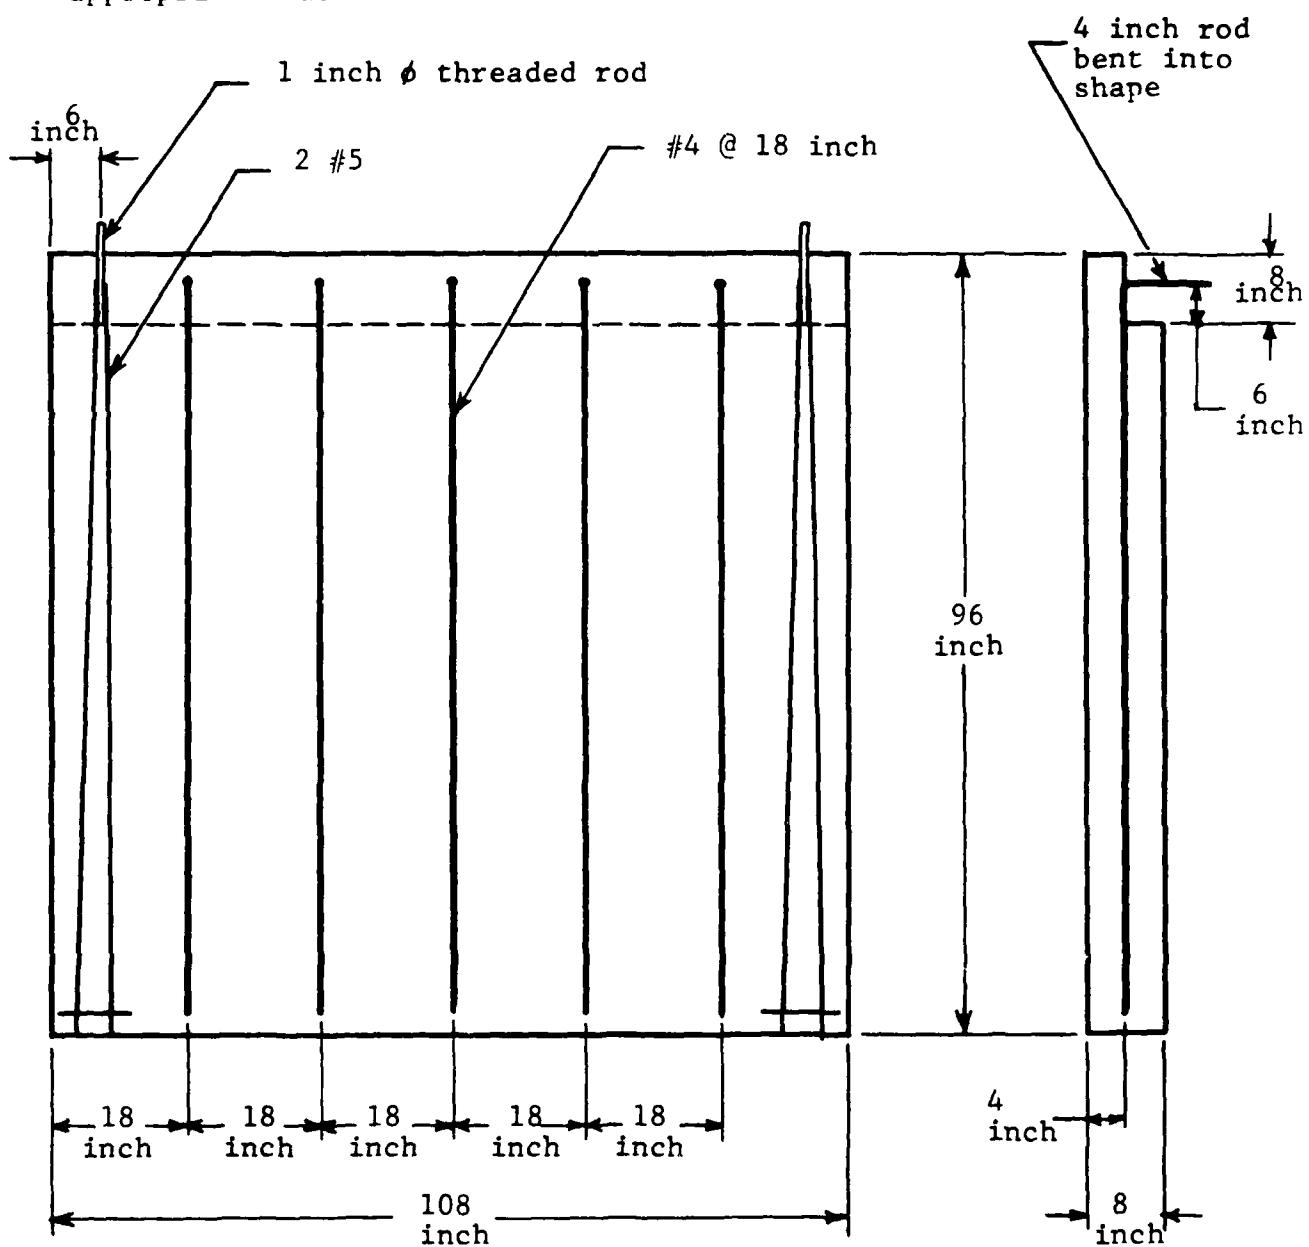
Typical 11-Story R/C Building Wall Panel Design
